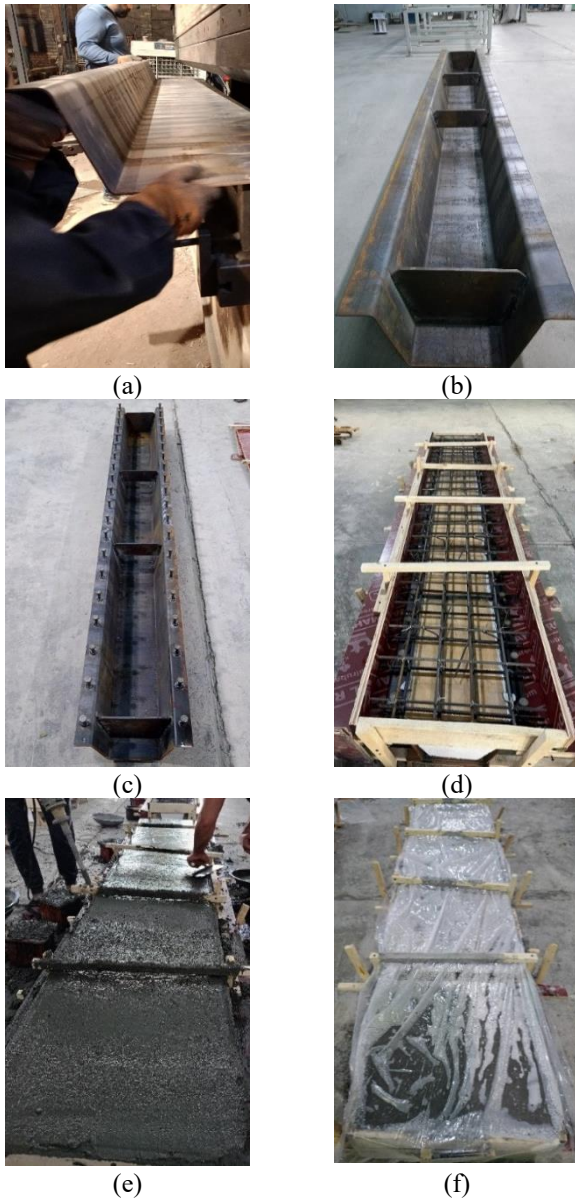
Specimens fabrication: (a) cold-formed plate, (b) welding the stiffeners plate, (c) welding the shear studs, (d) formwork and reinforcement, (e) casting, and (f) curing
